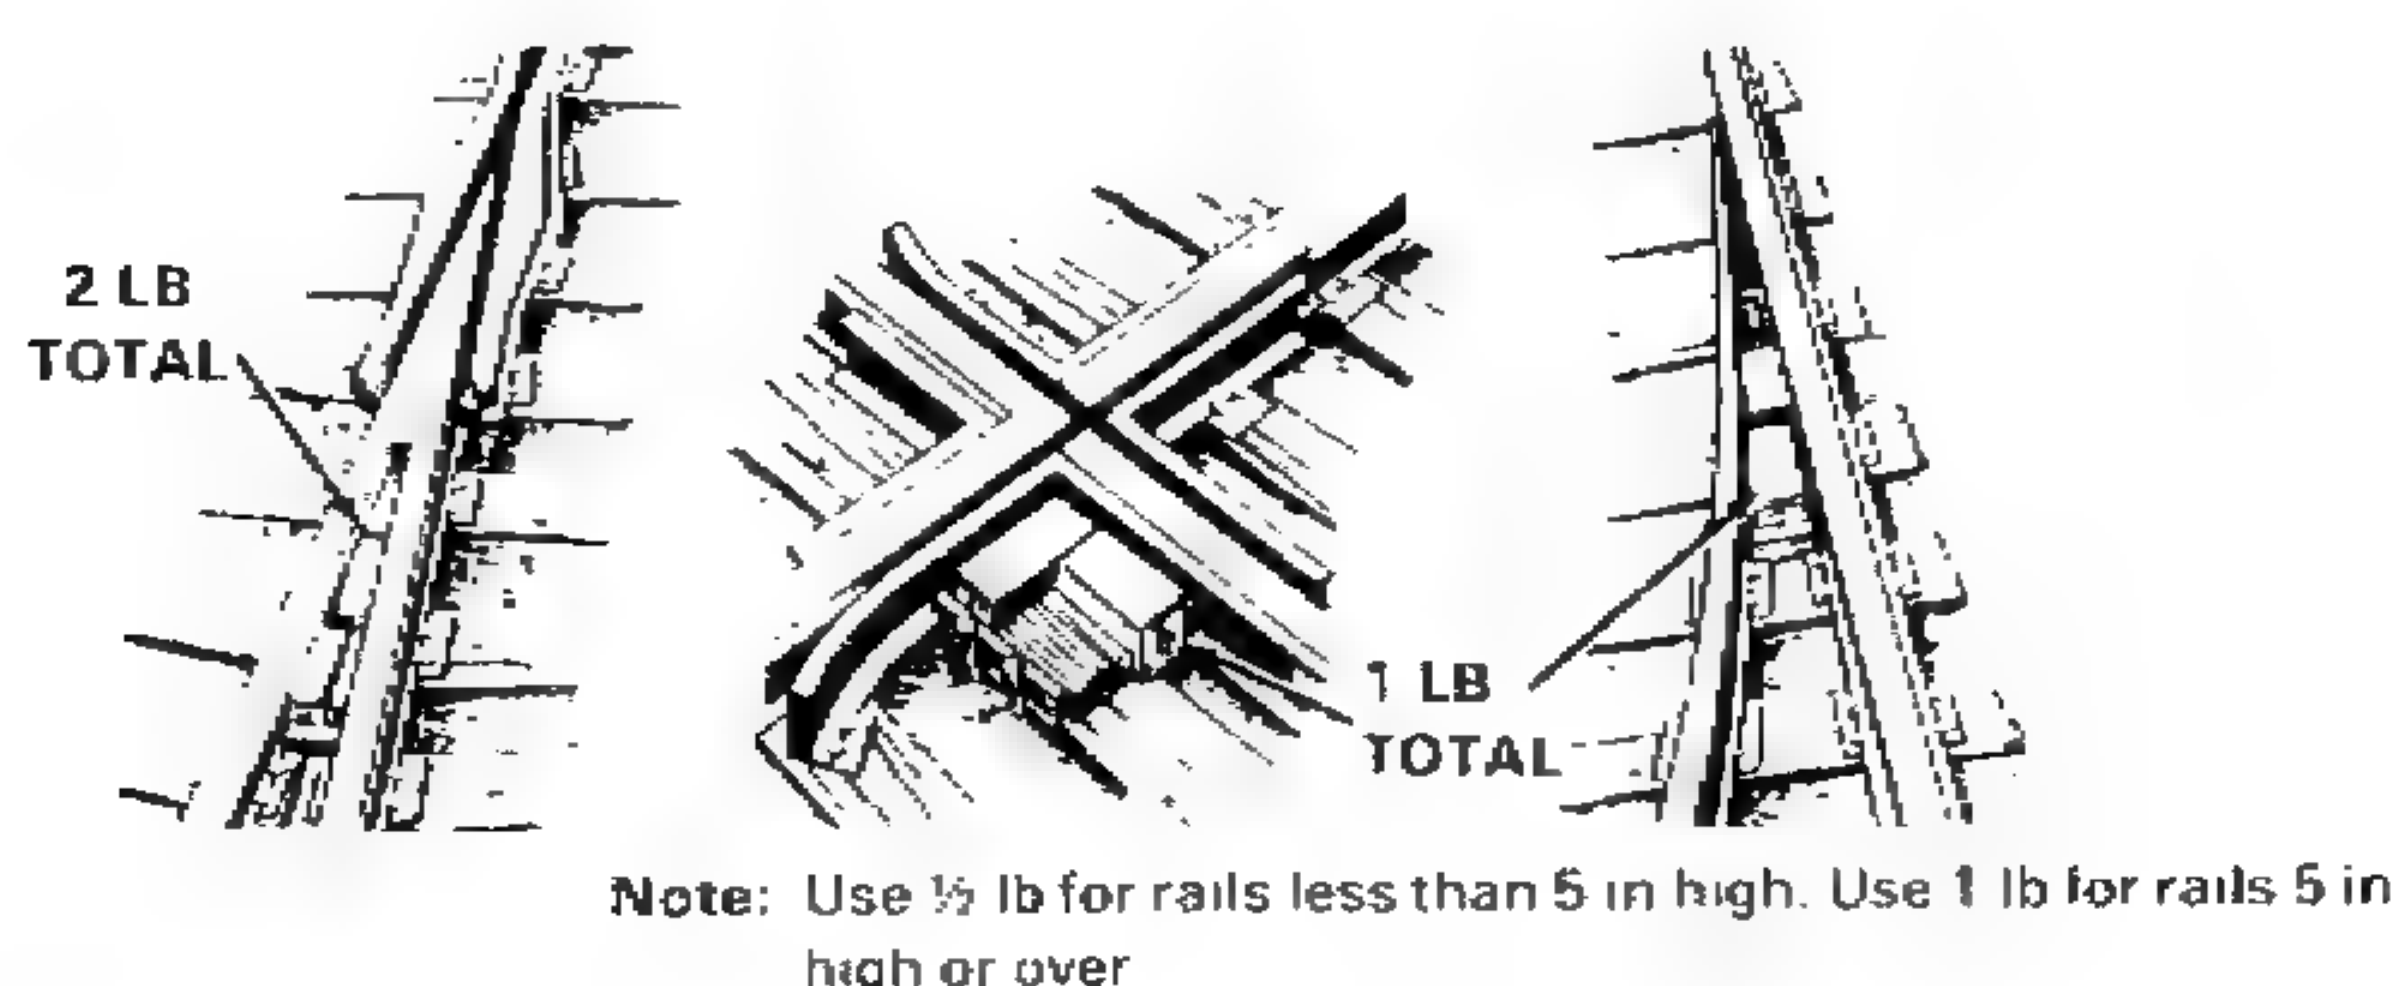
Demolition of railroad switches, frogs, and crossovers
